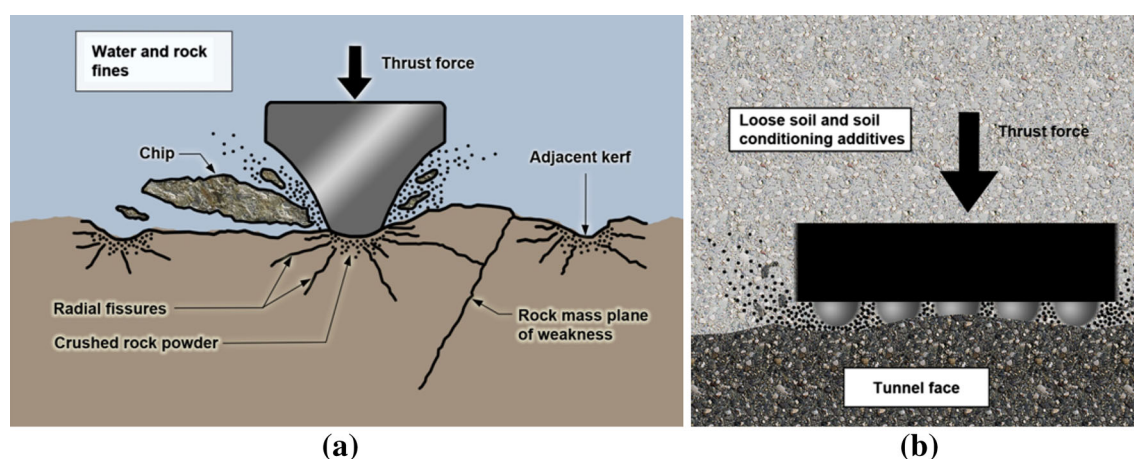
Simplified tribo-systems involving tunnel boring machine (TBM) tools: a hard disc rock cutter (after Bruland 1998a, b) and b ripper tool with carbide steel inserts
